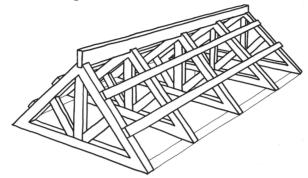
This roof frame is a frame structure made from wooden planks, a natural material. The planks support the roof.
